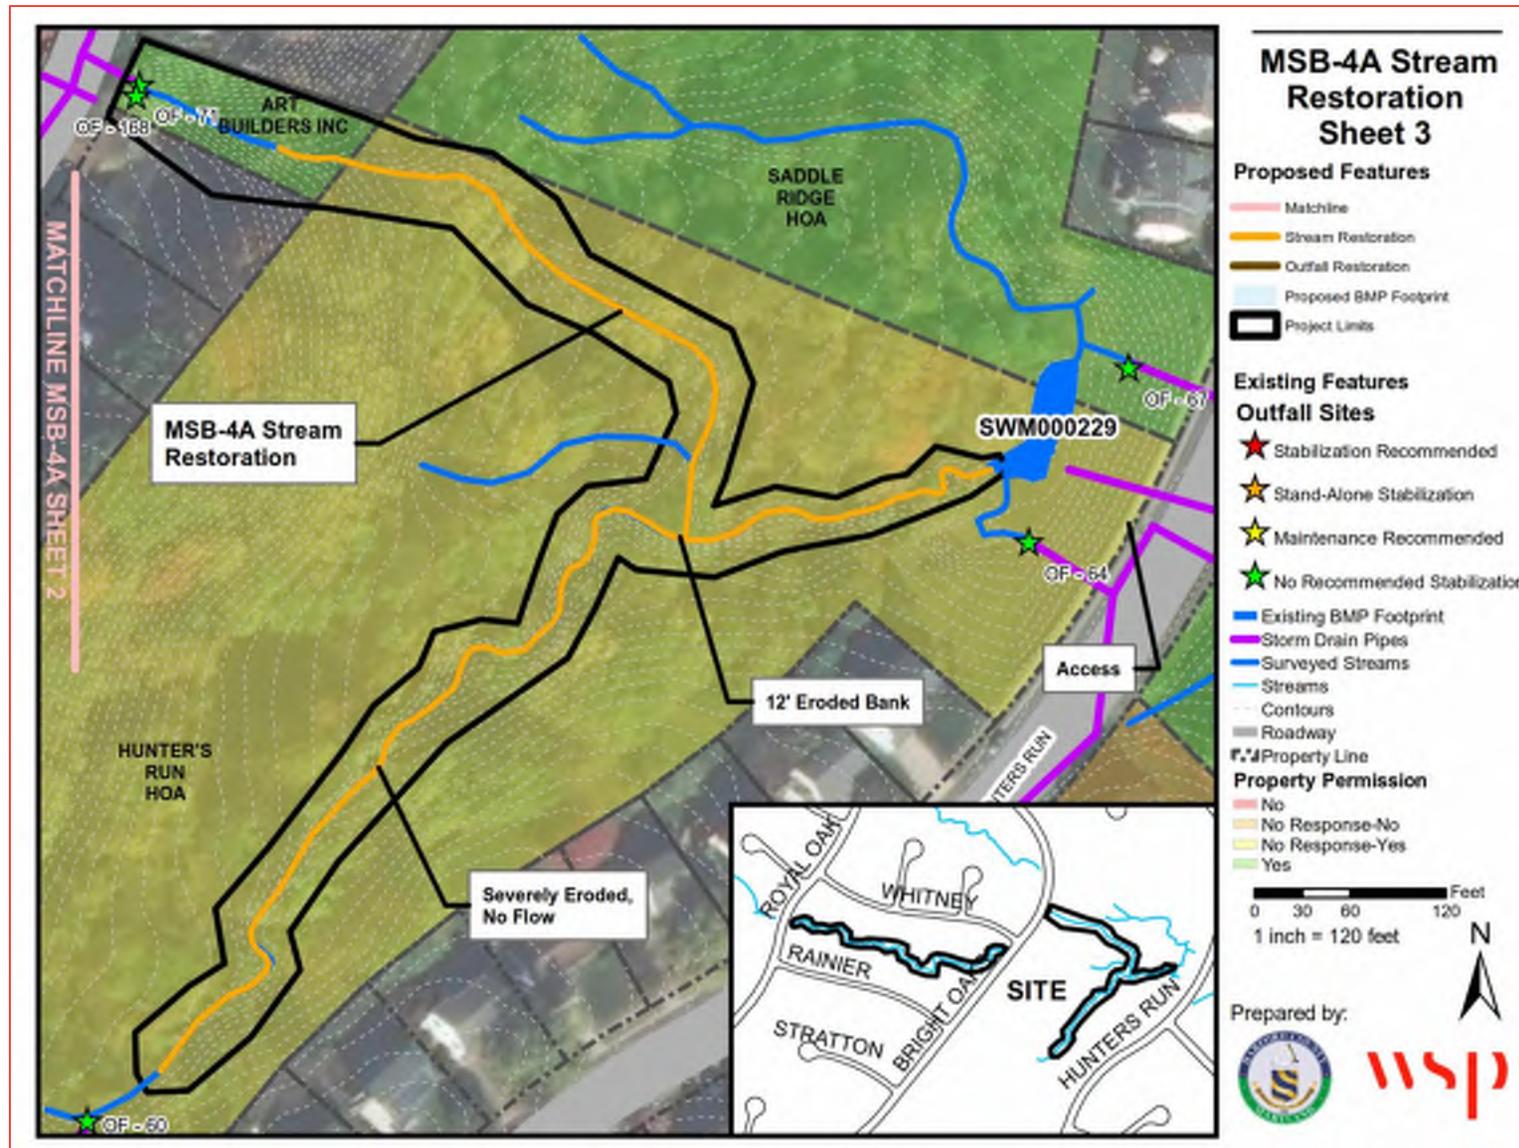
Site Location and Proposed Plan for MSB-4A Stream Restoration (Sheet 3 of 3)
